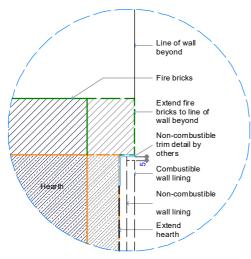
Plan View Fire Surround Opt. 2 Timber Cavity
